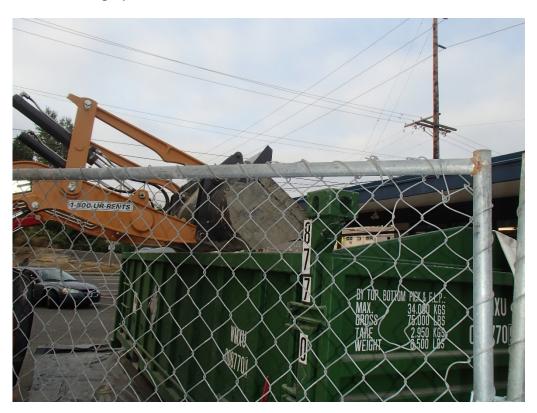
Open Trench Excavation Along Cherry Street Q-Tip Trust Building
